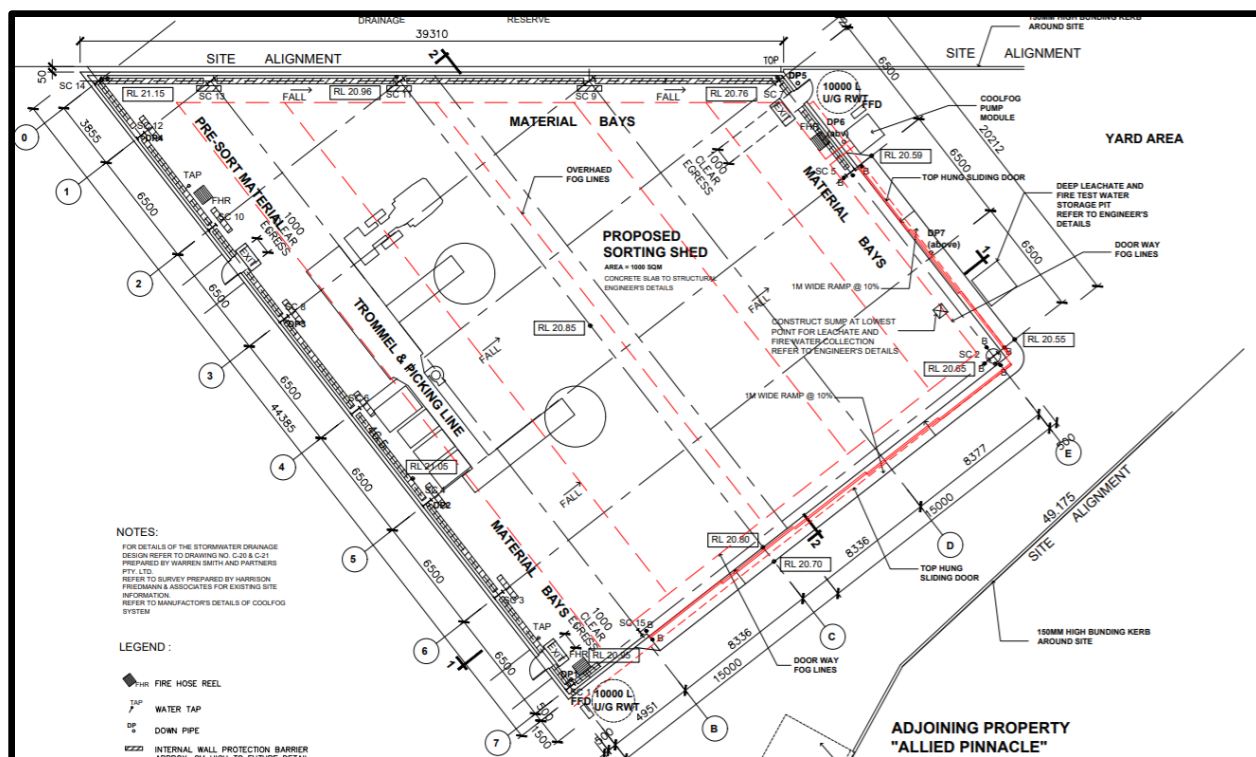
Proposed internal layout of the custom built “sorting shed” industrial warehouse building (courtesy: Robert Lee Architects, 2019)
